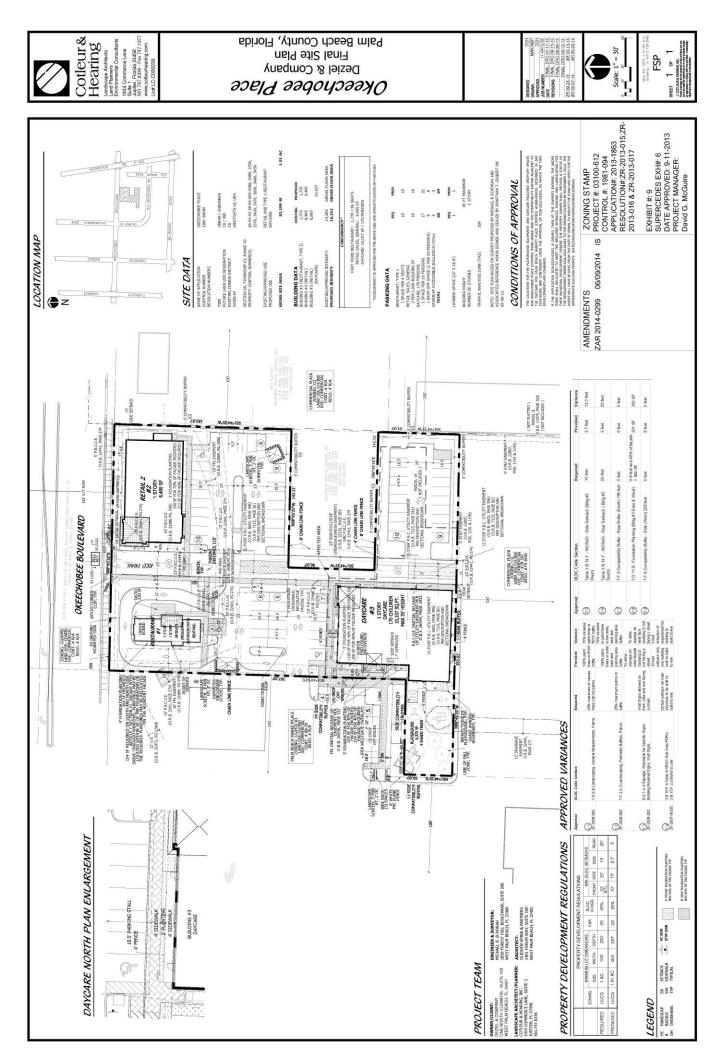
Approved Site Plan Dated September 11 2013, Control No. 1981-00094: Okeechobee Place
